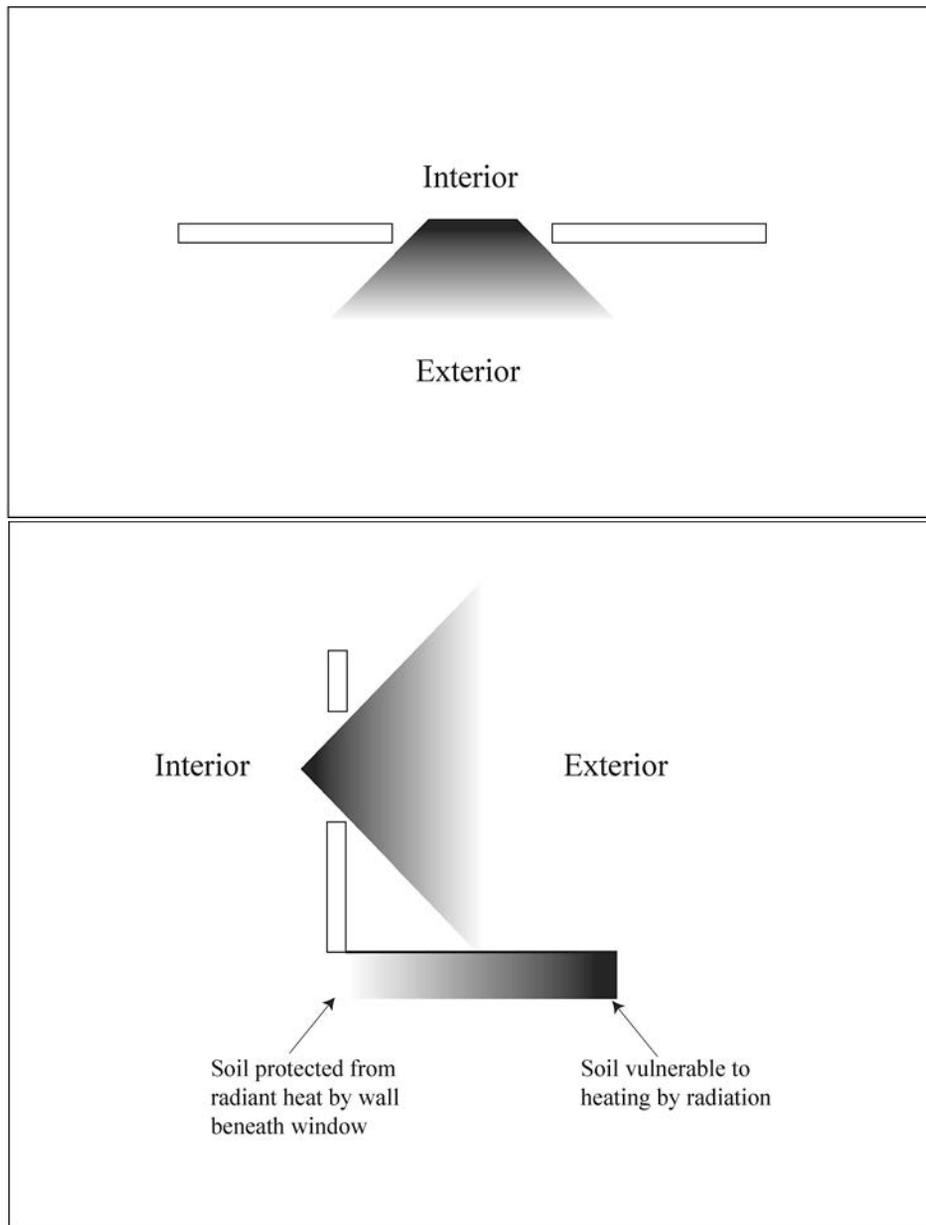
Schematic illustration to show the spread of radiated heat through doorway (top, in plan) and window (above, in section)
